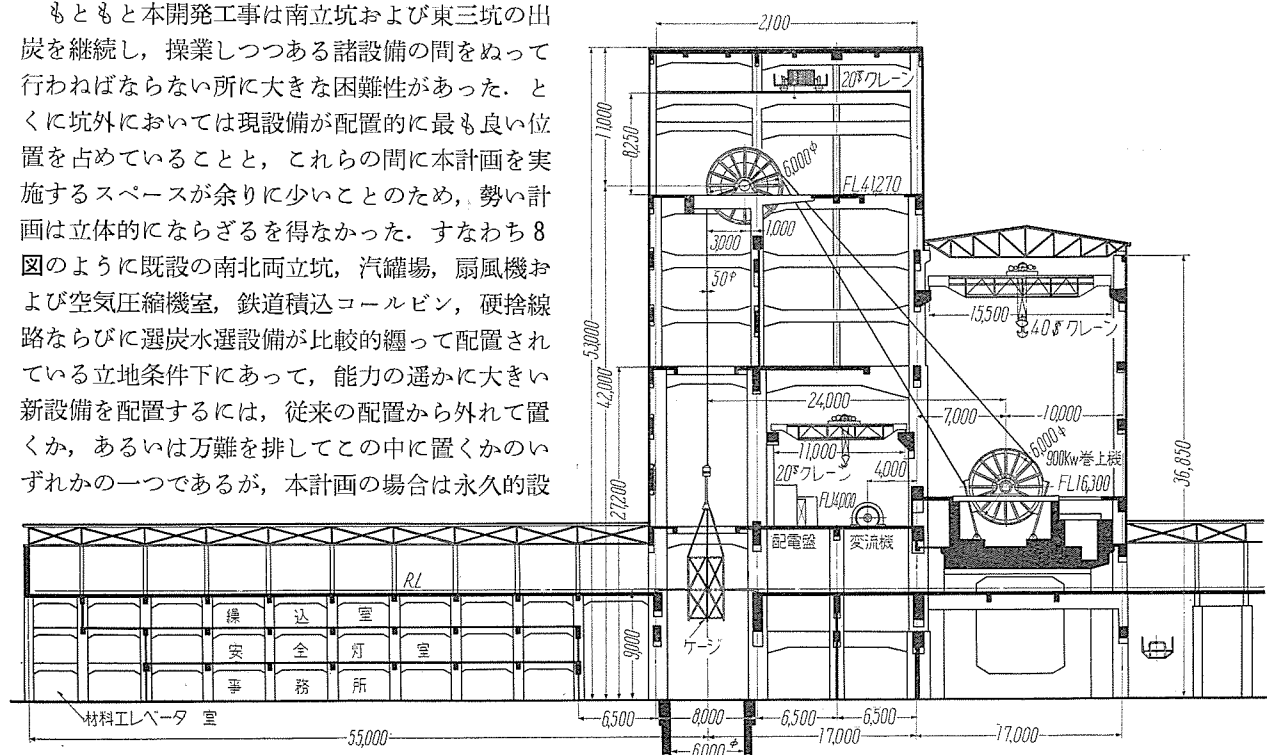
Cross sectional view of winding machine room at the north shaft.
